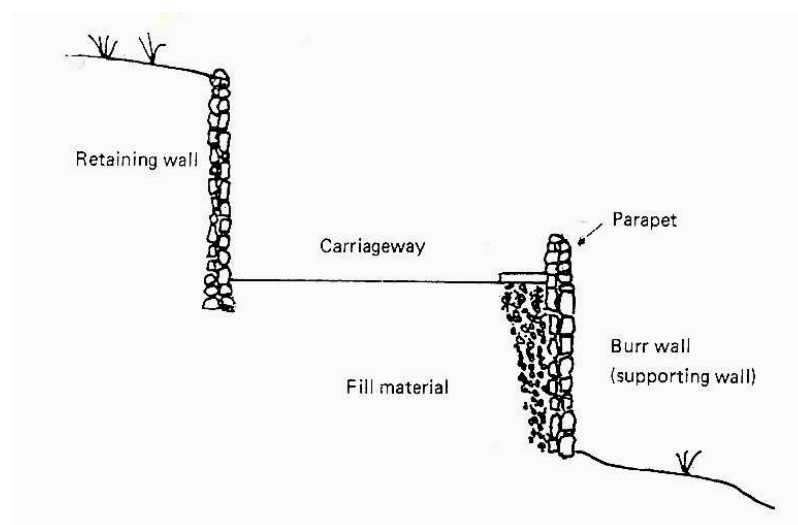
Dry stacked retaining wall (Sowden, 1990: 350)
